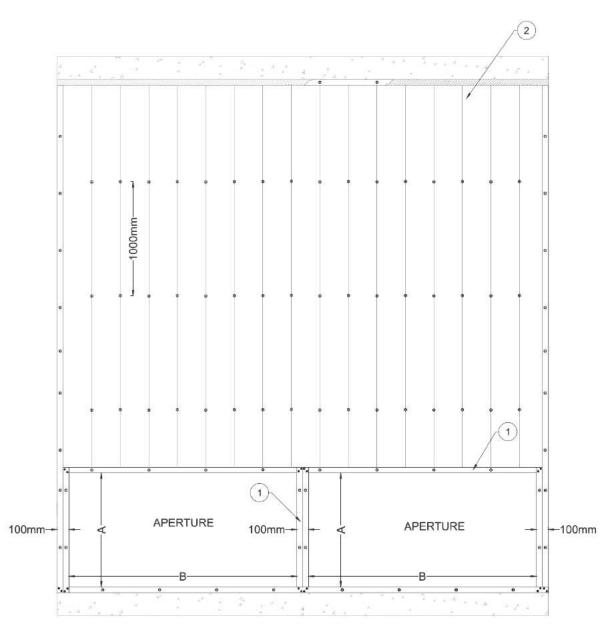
Vertical Speedpanel arrangement of apertures at the bottom of the wall
